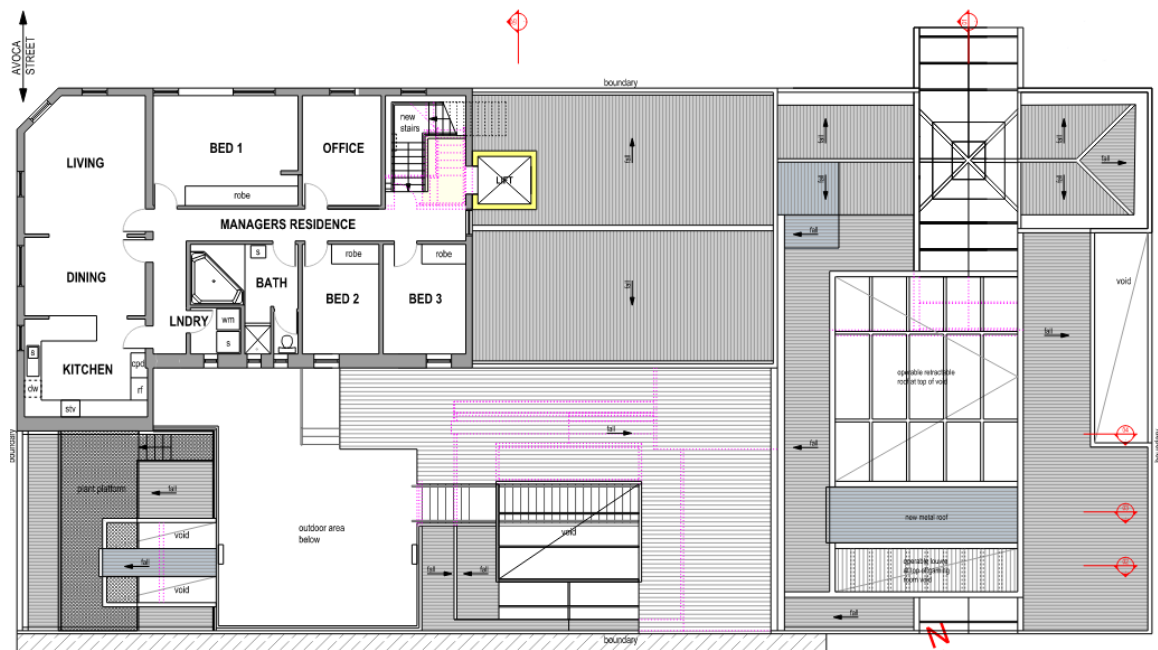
Proposed second floor plan (Source: Darren Mah Design)
